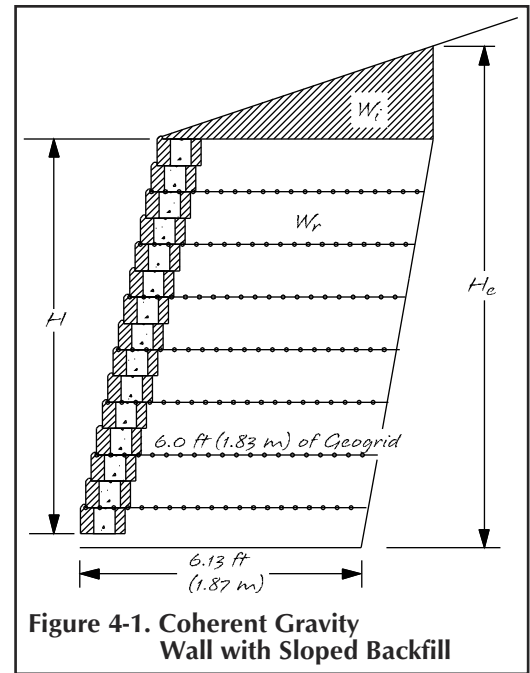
Coherent Gravity Wall with Sloped Backfill
